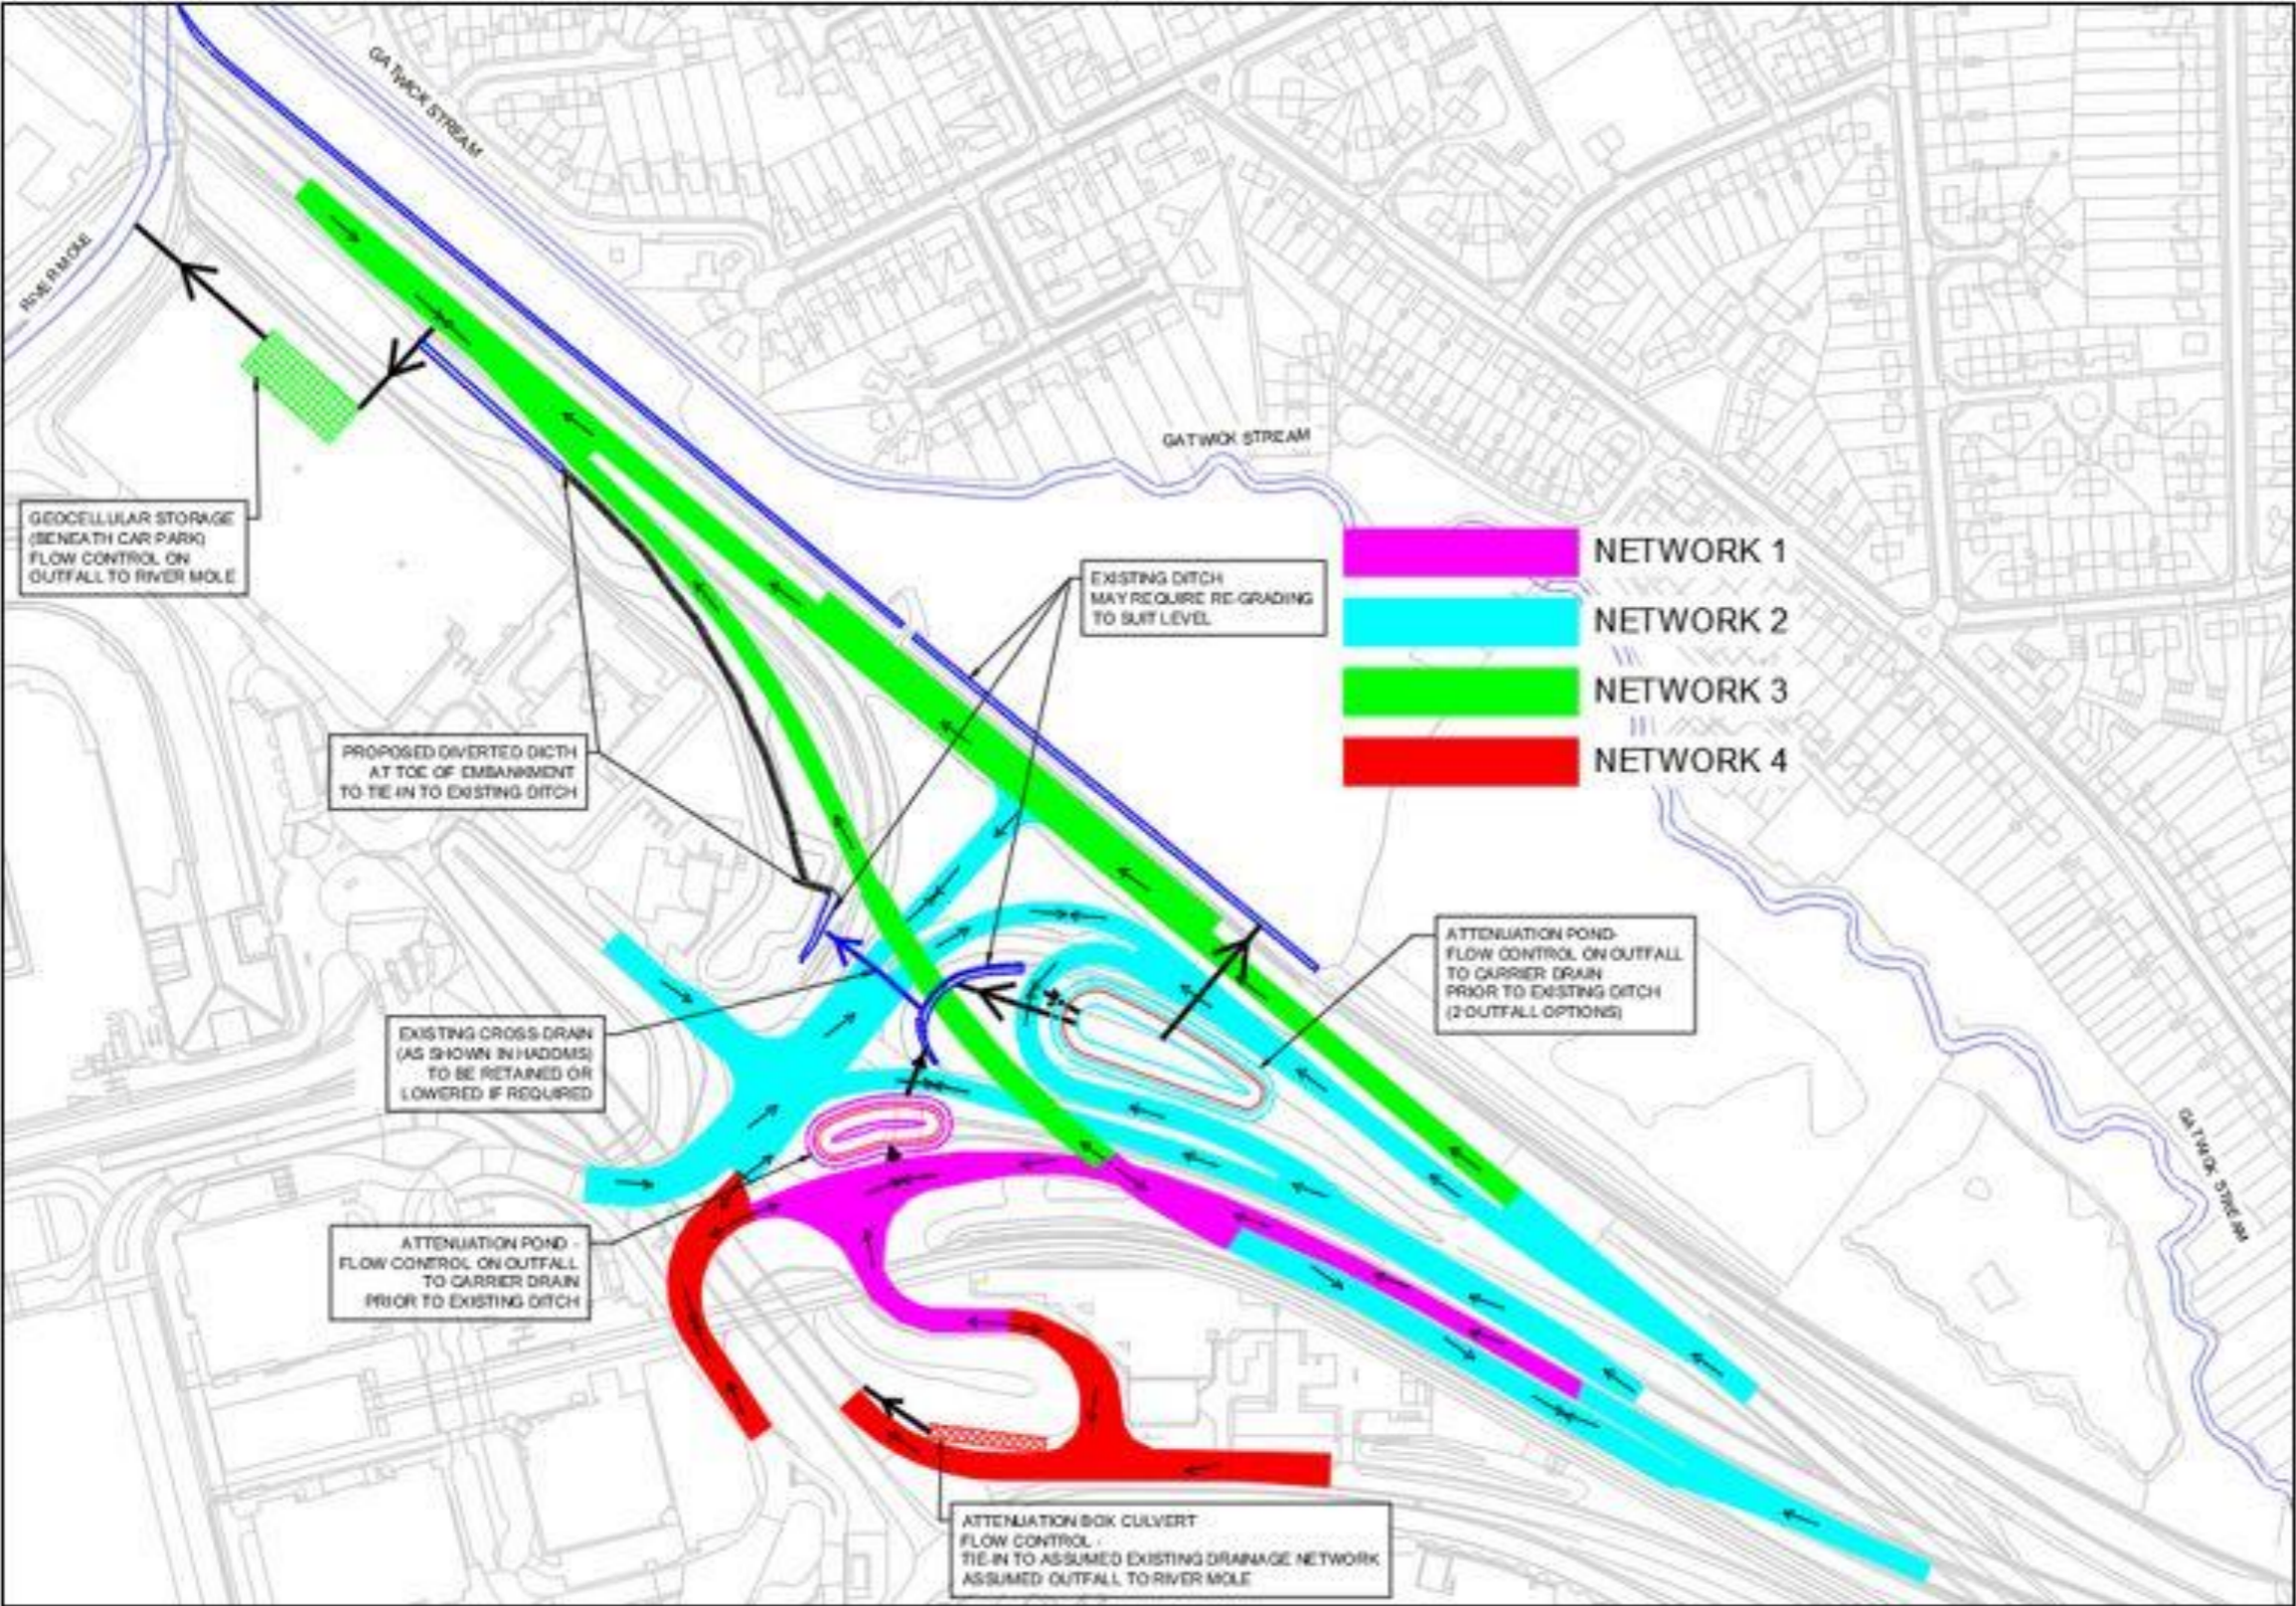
Indicative Longbridge Roundabout Drainage Layout
